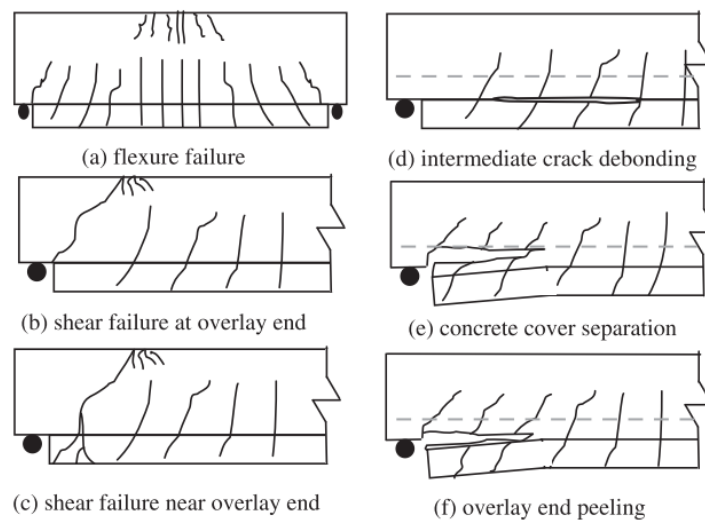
Failure modes of overlay strengthened beams (extracted from [17])
